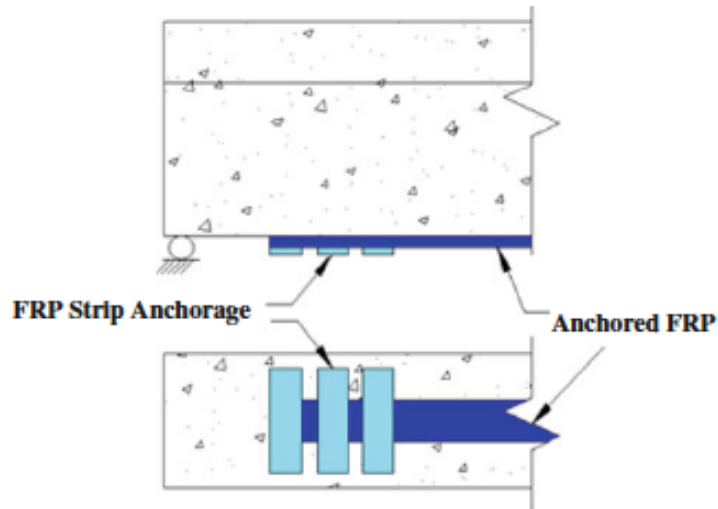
16 - Example of FRP strip anchorage (Galle and Sneed, 2013)
